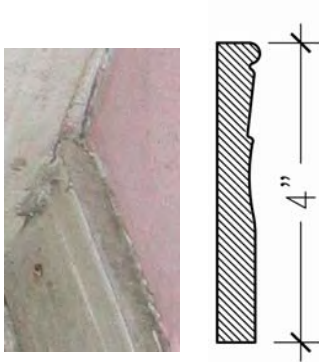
Photo and profile of Base Type 4. (Photo: BBB, 2007)
